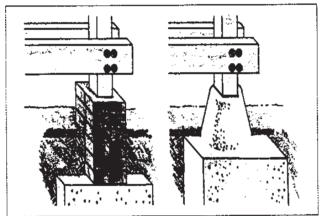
Above left: Brick or block Pier. Right: Concrete pier cast in a bucket
